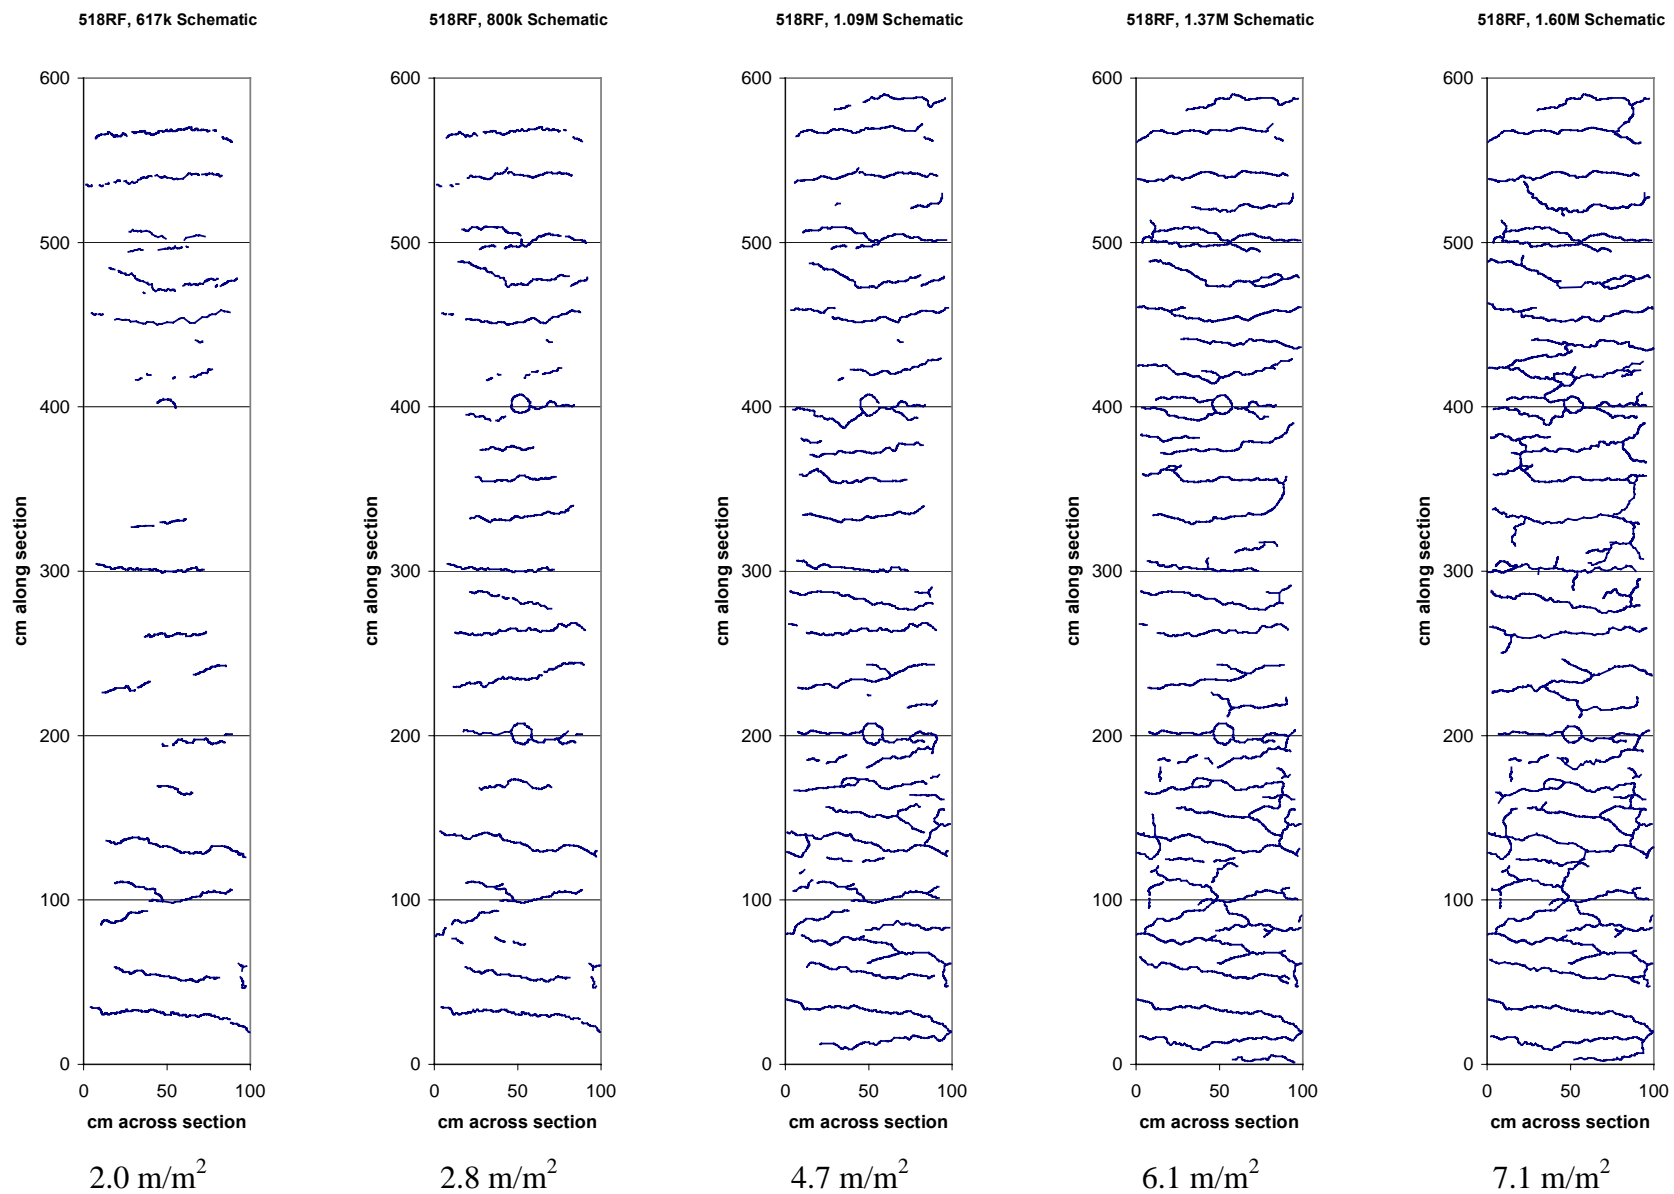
Crack development in Section 518 (undrained, ARHM-GG overlay).
